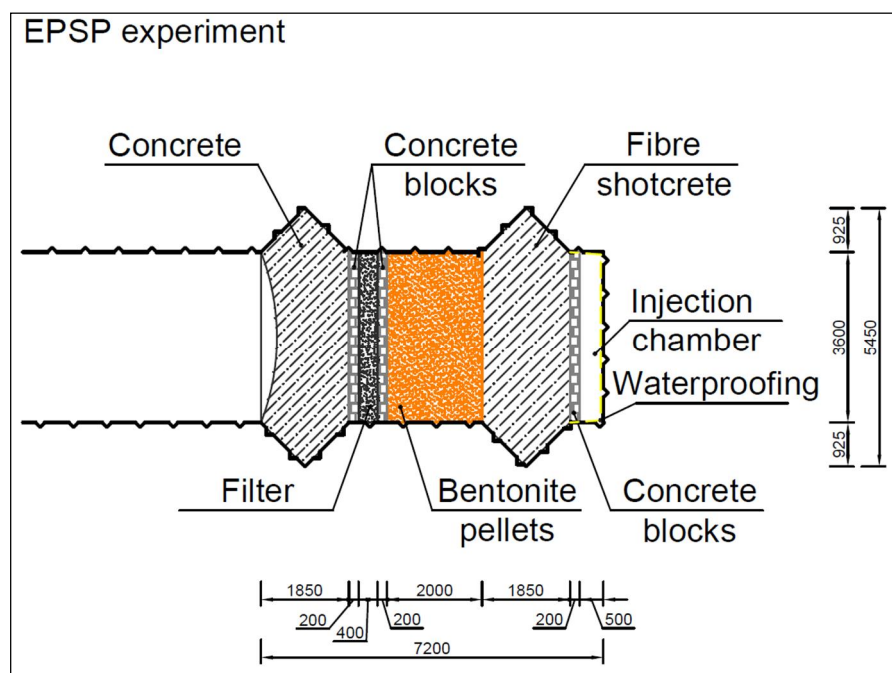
Schematic illustration of the EPSP experiment design. Dimensions are given in millimetres (mm). Source: CTU.
